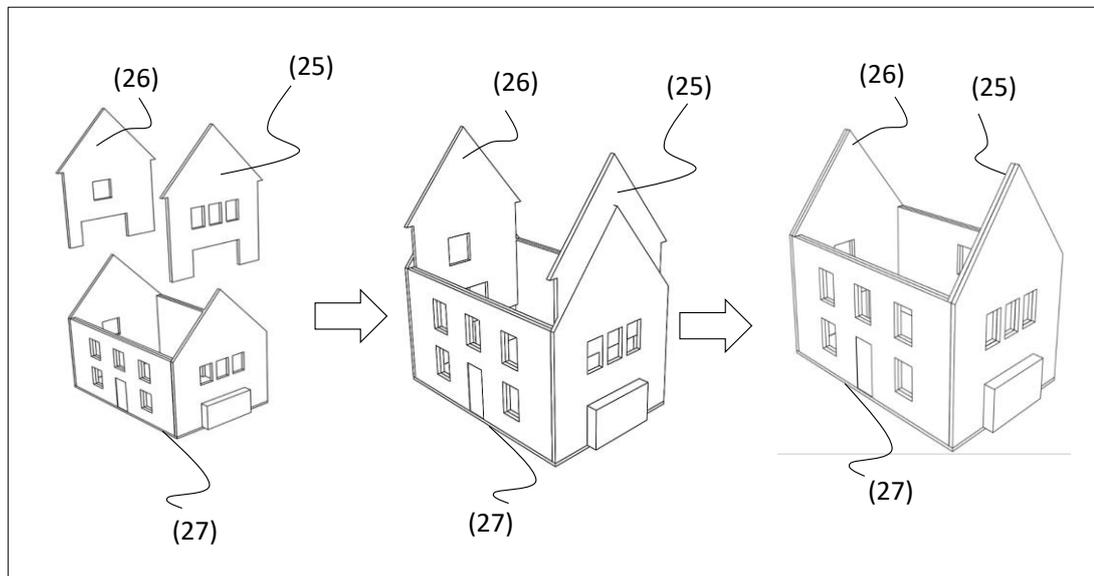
The installation of the insulation layers to two walls of the building model.
